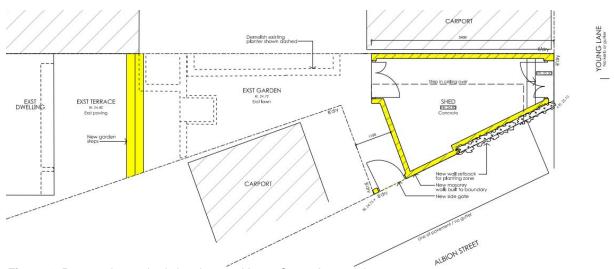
Proposed rear shed site plan at 7 Young Street Annandale.
